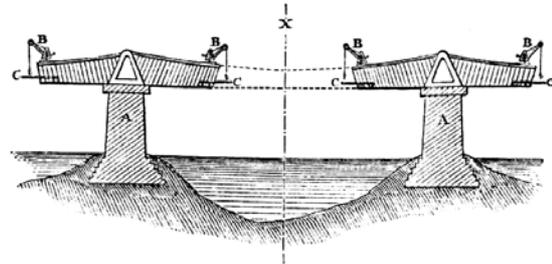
Fairbairn's proposal to build a bridge using balanced cantilever erection method. (Fairbairn¹)
